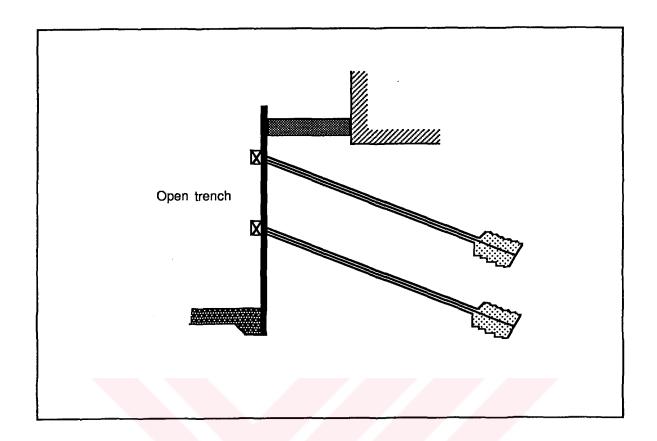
SECTION OF SHEET PILING WITH WALINGS AND GROUND ANCHORS
